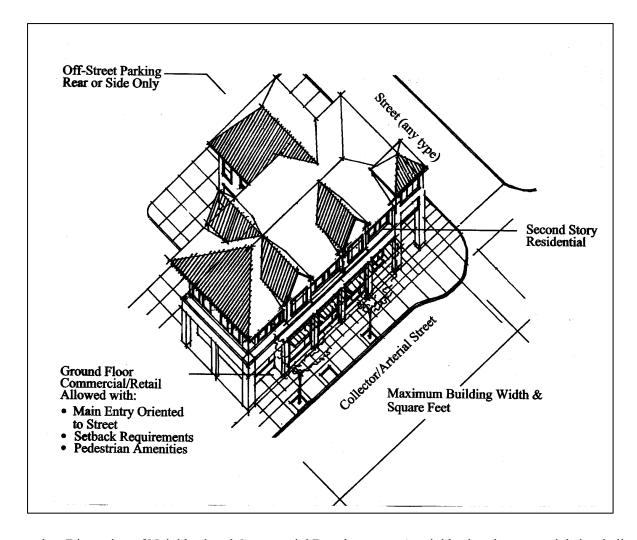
A - Neighborhood Commercial (Example of Site Layout)
